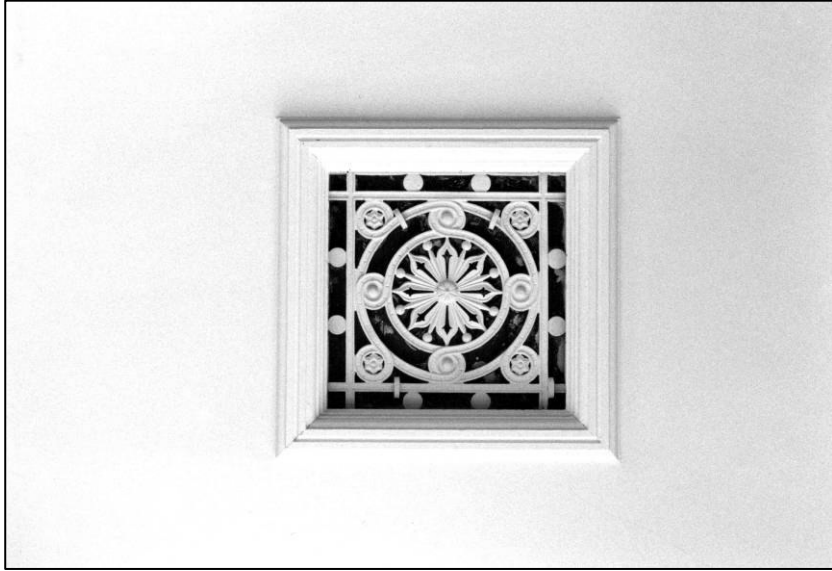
Church: 1F gallery: typical heating vent, looking N (photo 4/18).
